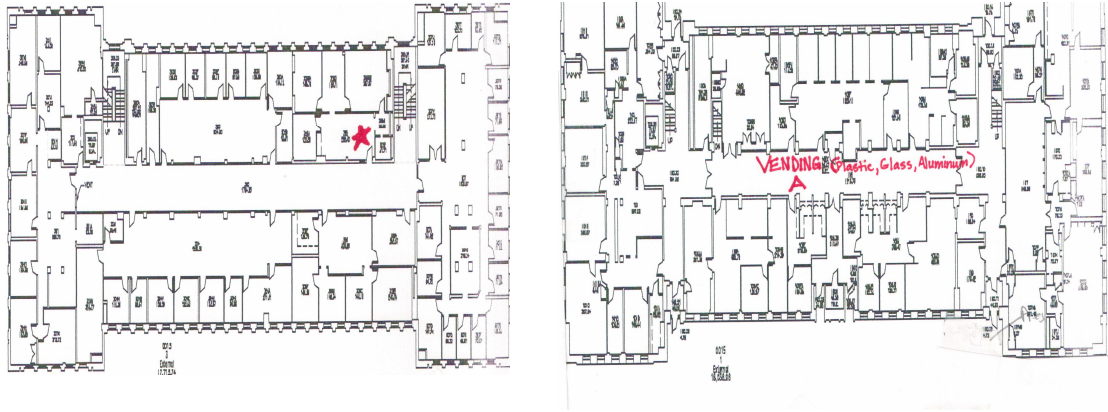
Administrative Building Floor Plan, 2nd and 4th floors; vending machines noted; red star denotes white paper receptacle; red “A”=aluminum receptacle.
